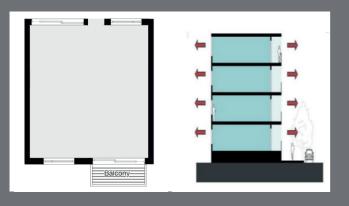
Floorplan & elevation for a dual aspect one bedroom flat
